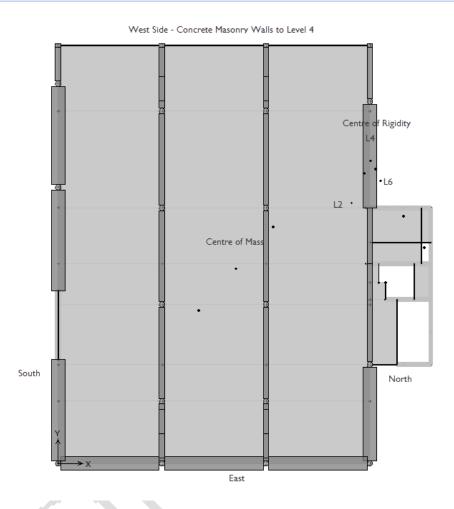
Centre of Mass and Centres of Rigidity for each Floor (ETABS model 1c - Concrete Shear Walls and Concrete Masonry Walls and Concrete Frame)
